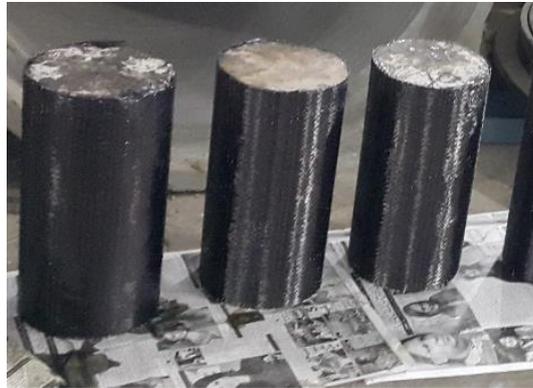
Concrete cylinder strengthened using CFRP sheets
